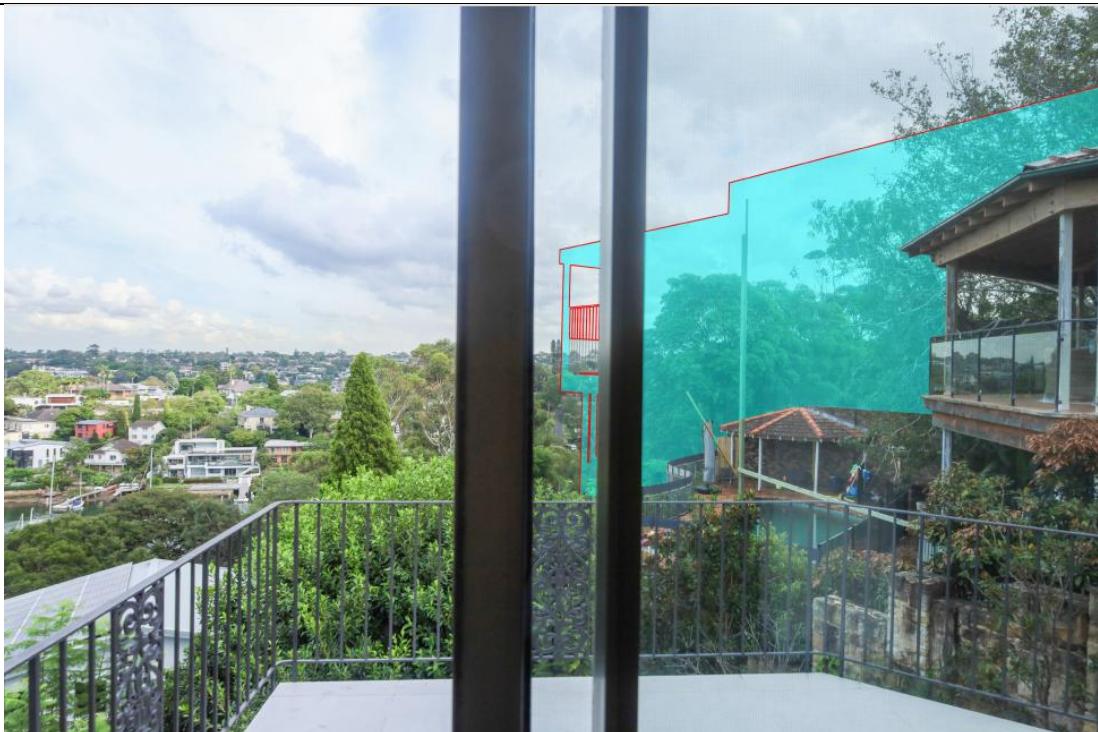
Side boundary visual impacts as detailed in the provided View Impact Assessment.
